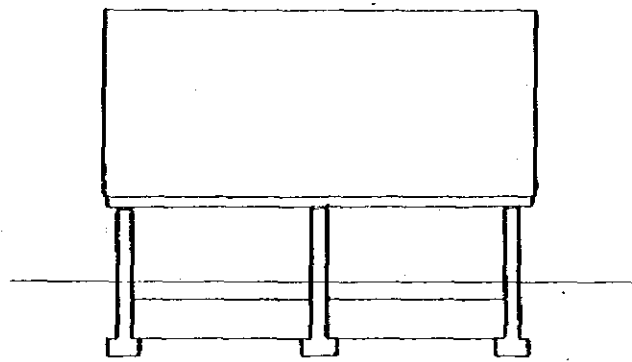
Layout of Tower and Earth of Dongola
